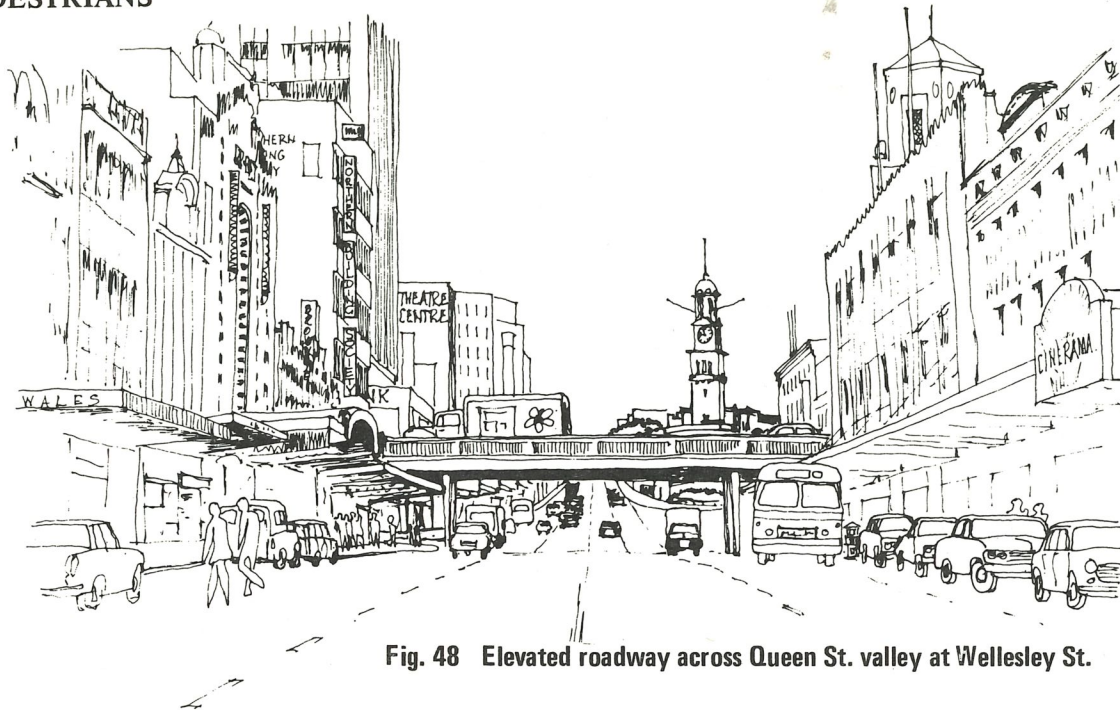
Elevated roadway across Queen St. valley at Wellesley St.
